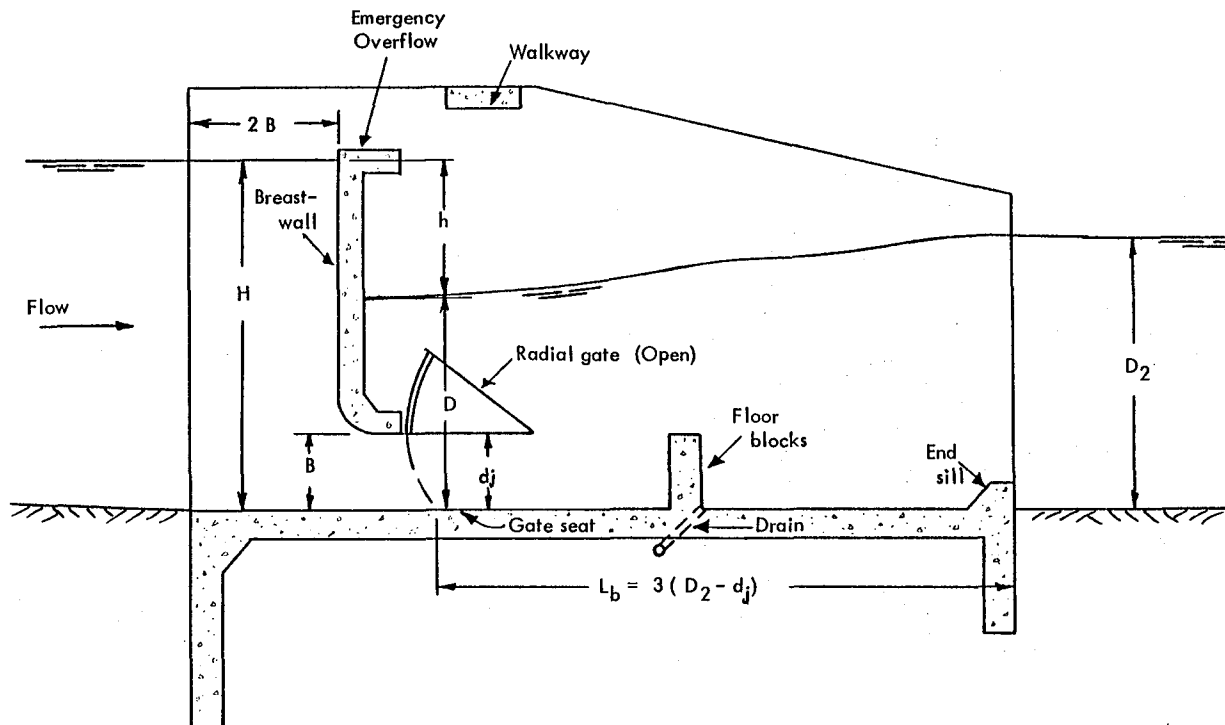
Section View of a Breastwall Check with Rounded Lip and Floor Baffles
